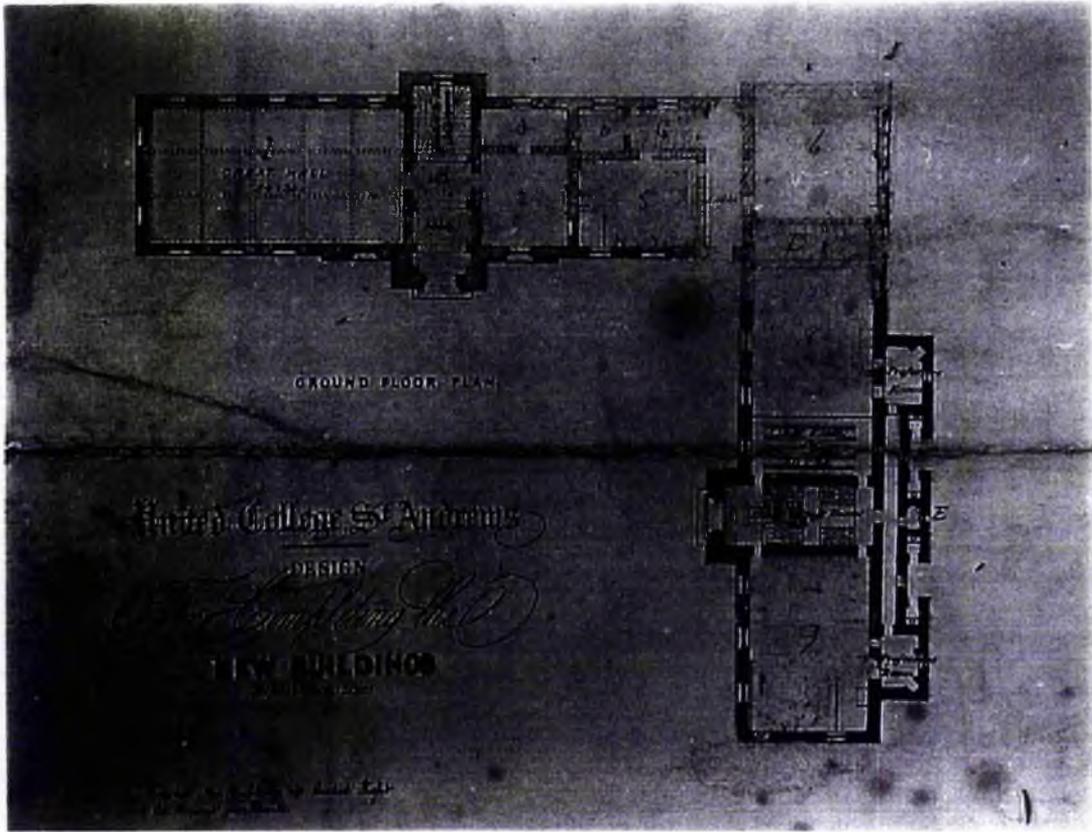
United College. Amended ground floor plan of north building. W. Nixon, February, 1845.
